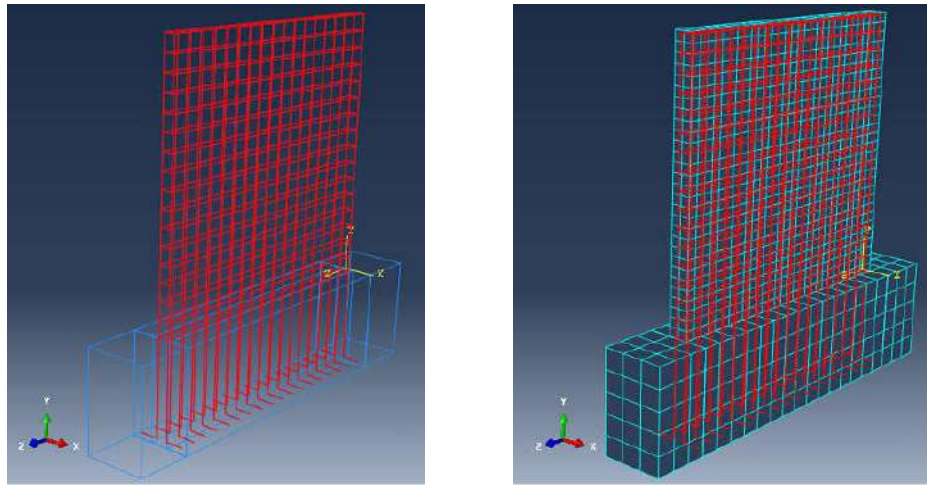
a) Reinforcement of the wall with Truss Elements ; b)Wall with bricks elements and steel reinforcement embedded into the wall.
